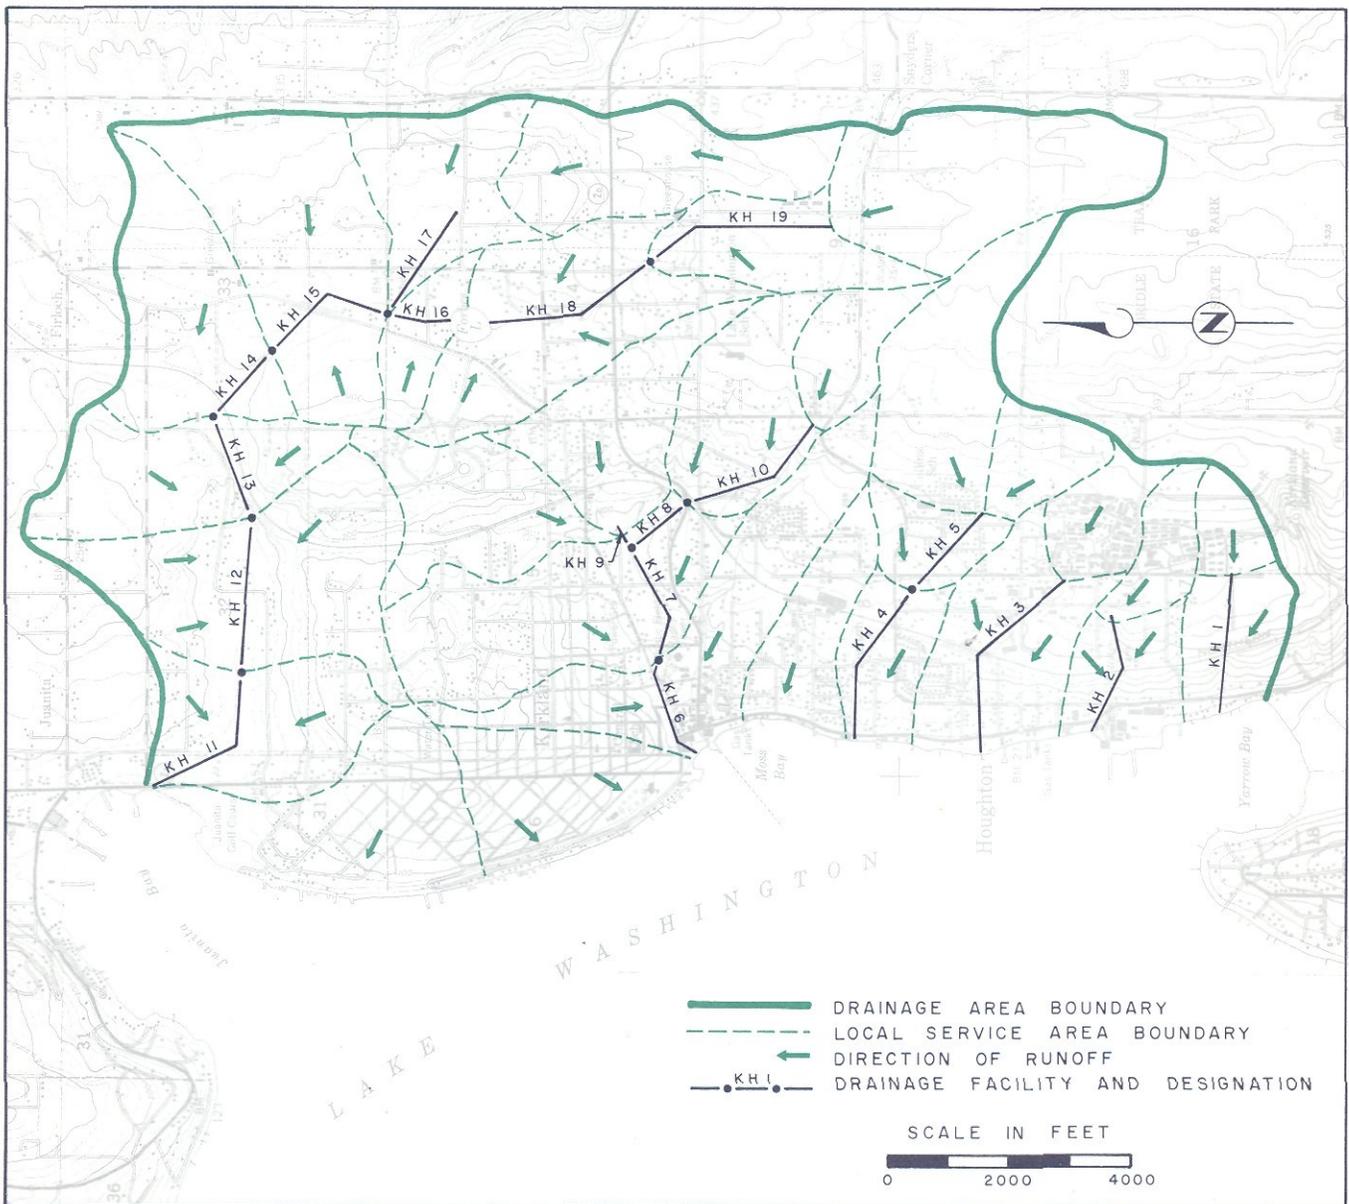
Storm Drainage Plans KH-A and KH-B, Kirkland-Houghton Area
